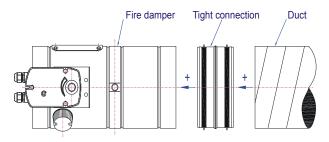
Connecting a damper of round cross-section with air tight connection joint, Code NT
